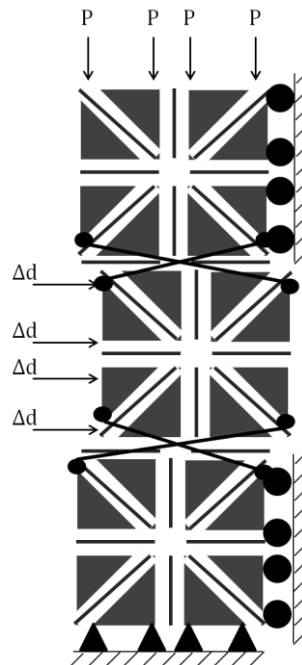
Additional steel elements to capture dowel action of reinforcement in grouted bed joints
